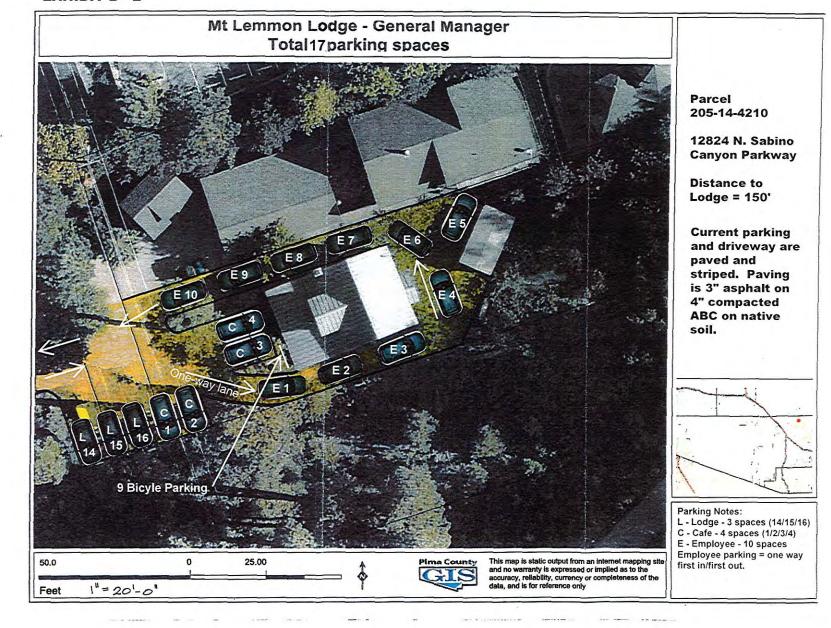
PARKING & SIDEWALK IMPROVEMENTS
